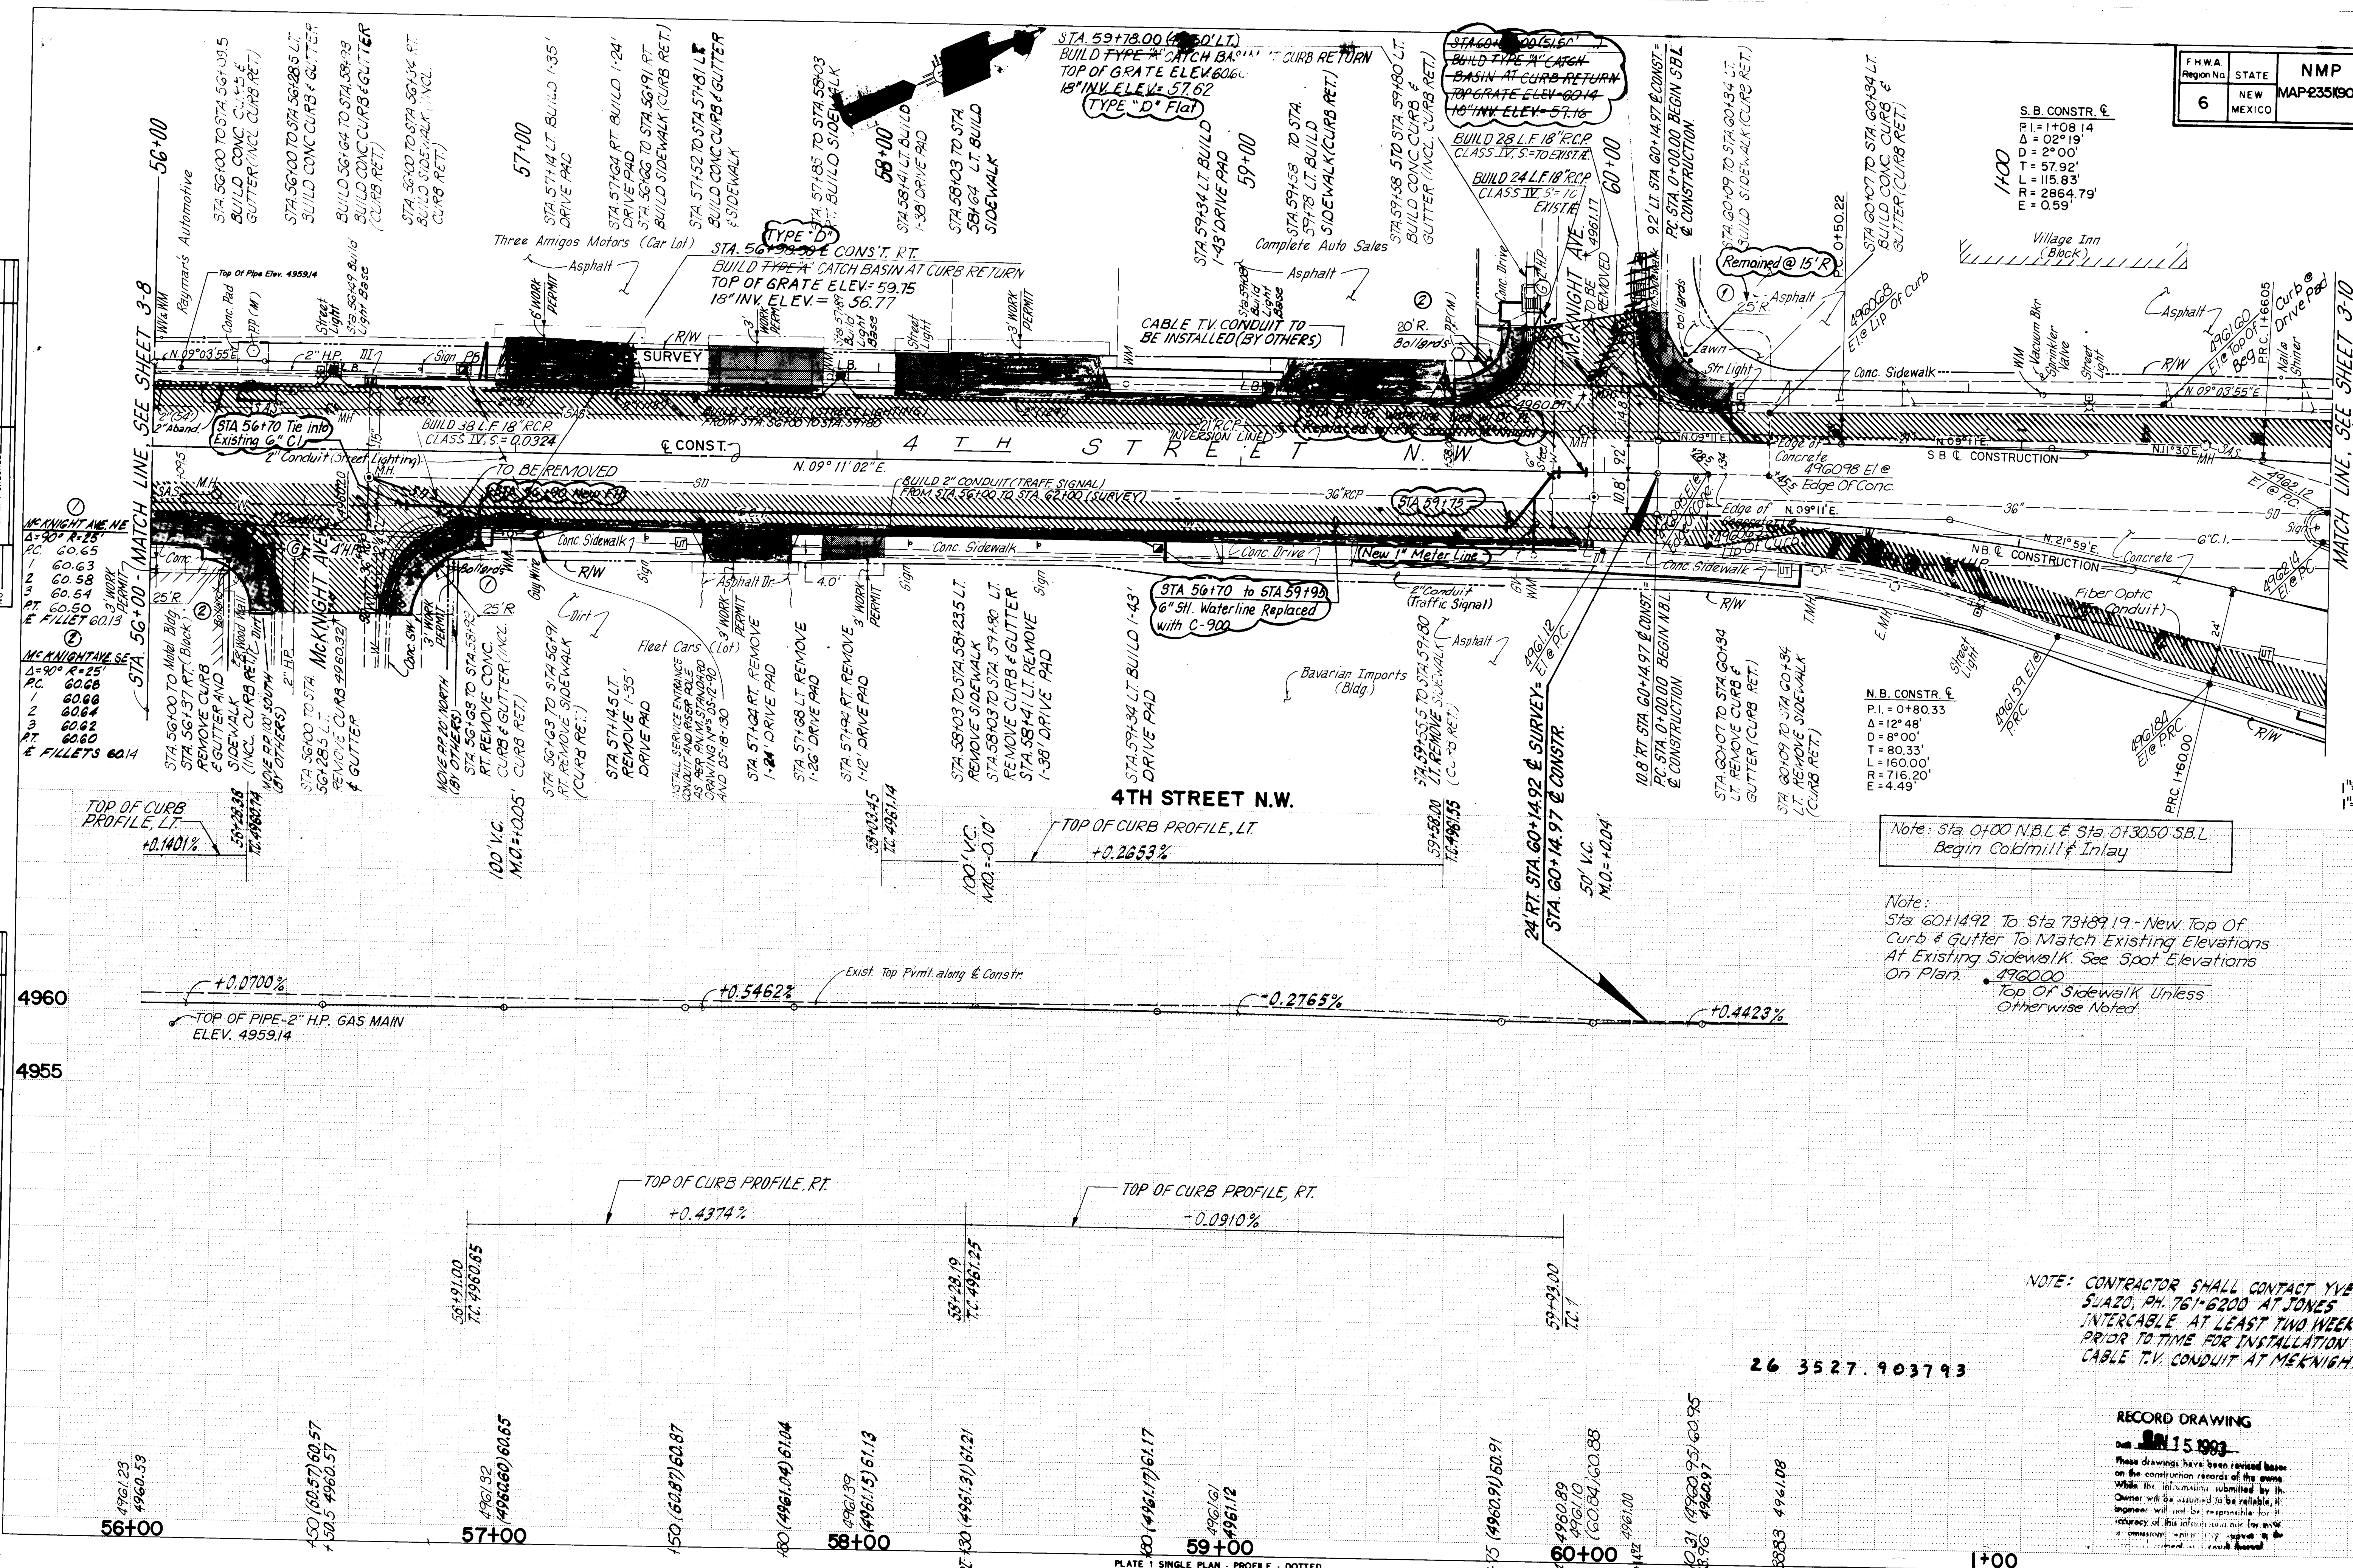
SINGLE PLAN - PROFILE - DOTTED
